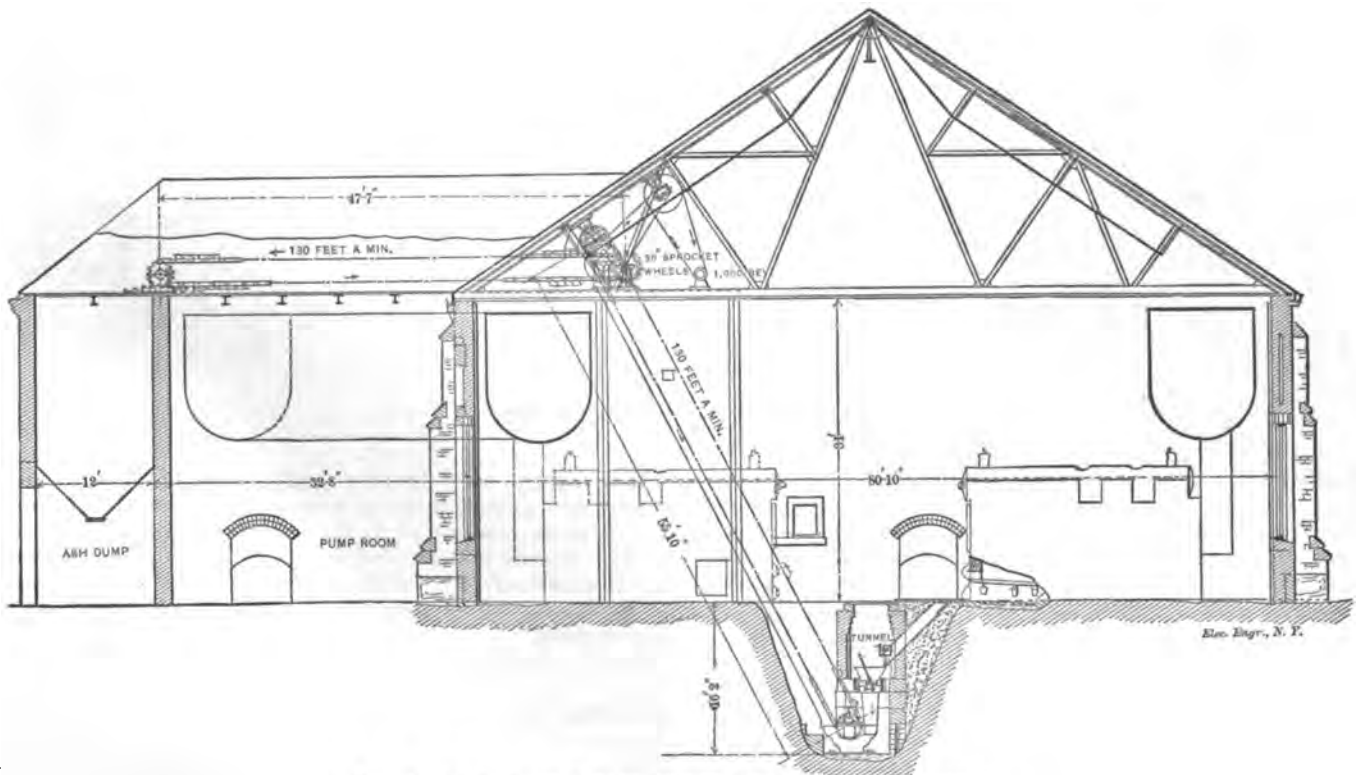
SECTION OF BOILER HOUSE SHOWING ASH CONVEYORS
